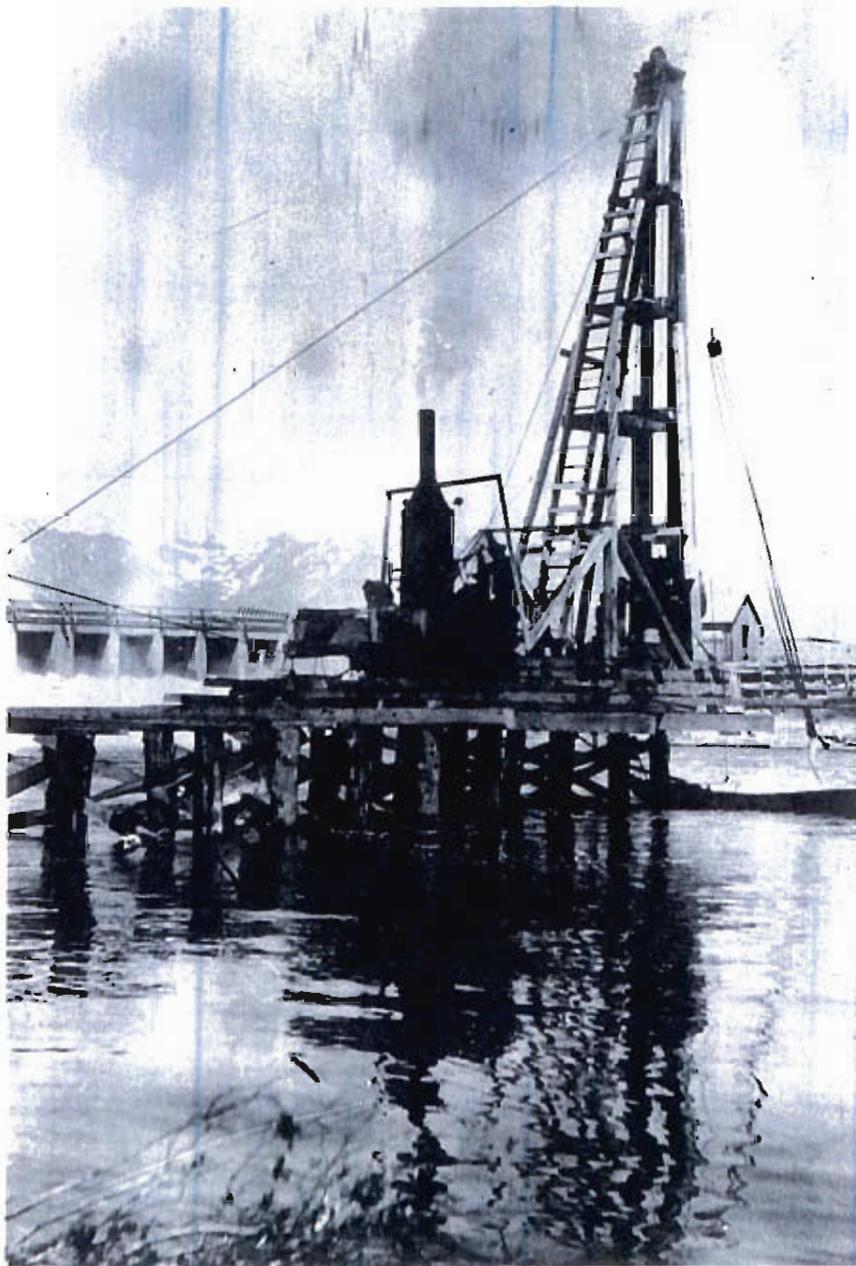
Pile driver constructing temporary bridge across Snake River. Note original dam in background.
